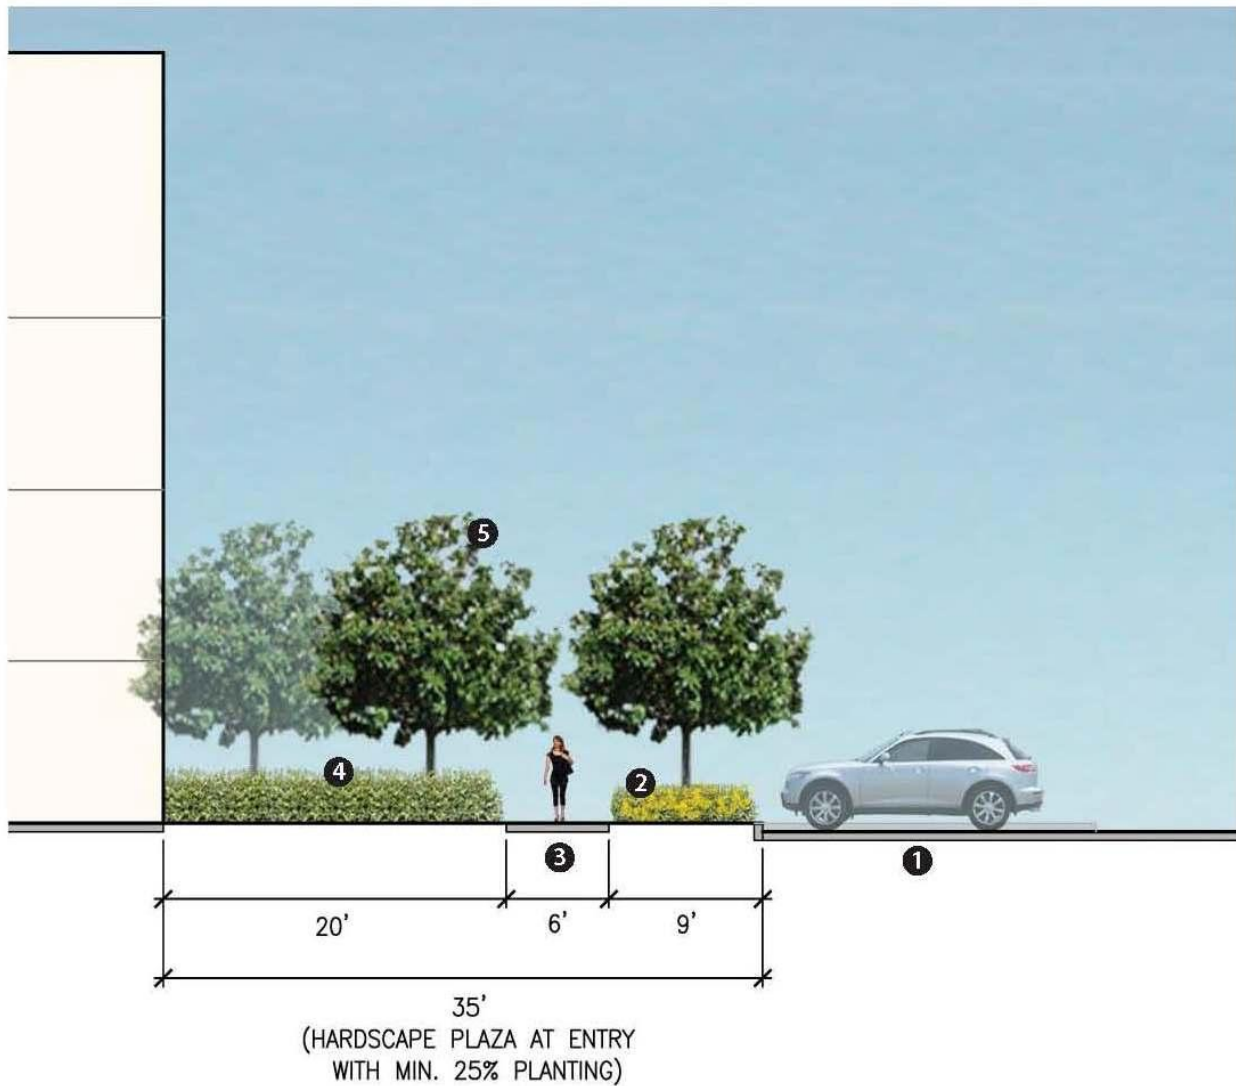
1-2 Story Office Building Front Facade
